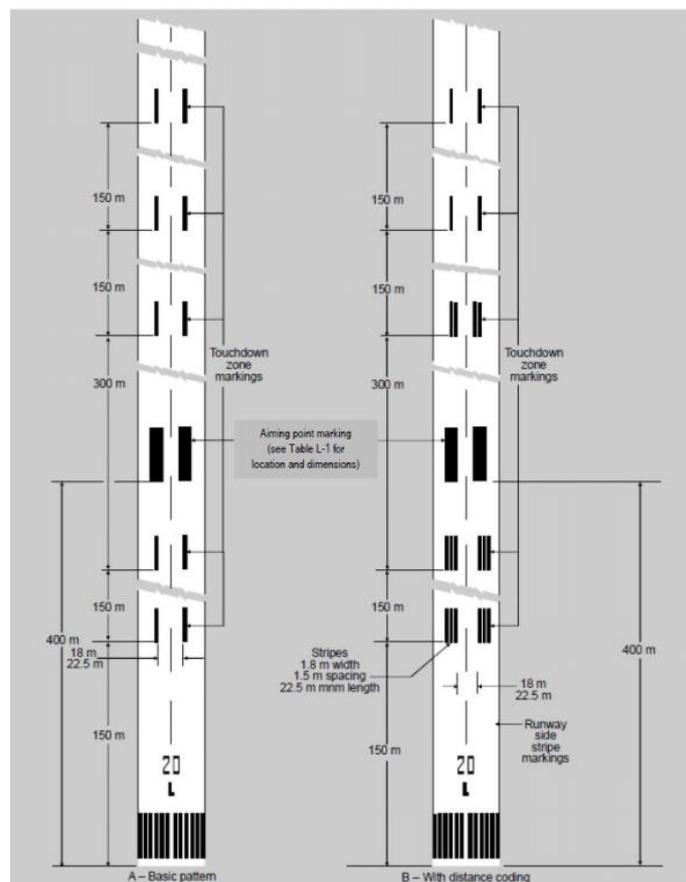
Aiming point and touchdown zone markings (illustrated for a runway with a length of 2 400 m or more)
